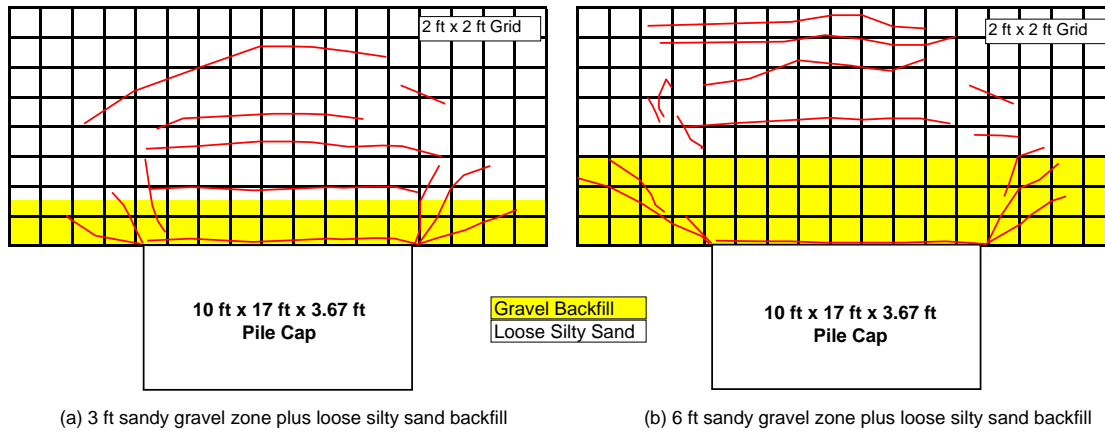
Plan view of crack patterns behind a pile cap after excavation and replacement of loose silty sand with (a) a 3-ft and (b) a 6-ft zone of compacted sandy gravel behind the pile cap (Rollins, Kwon, and Gerber 2008)
